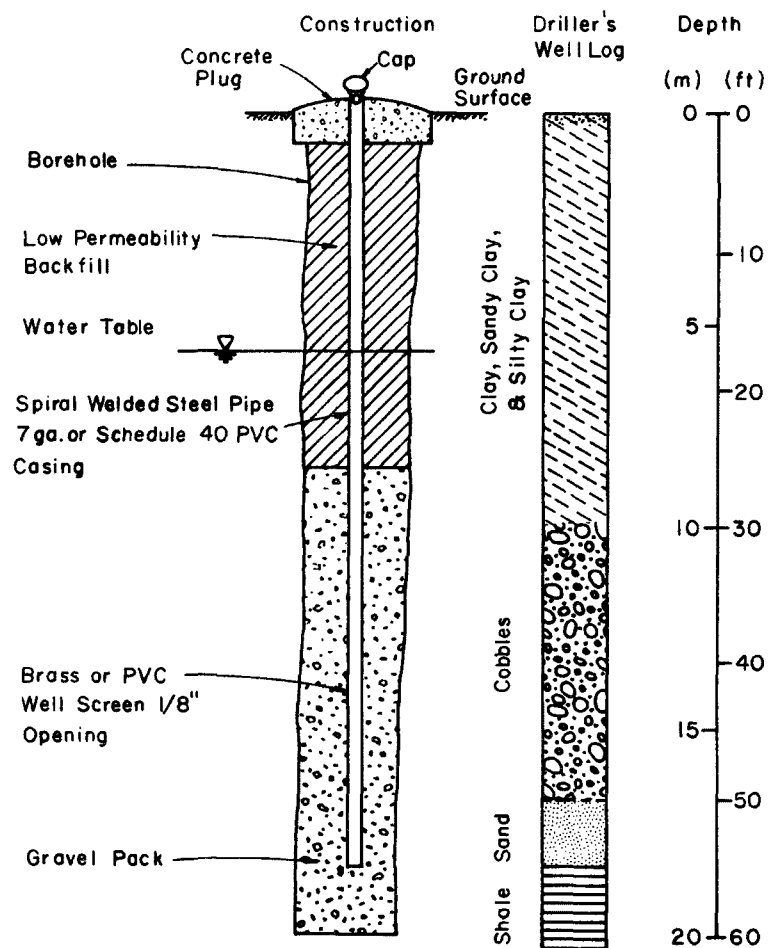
Sketch of typical observation well construction and the associated driller's log.
